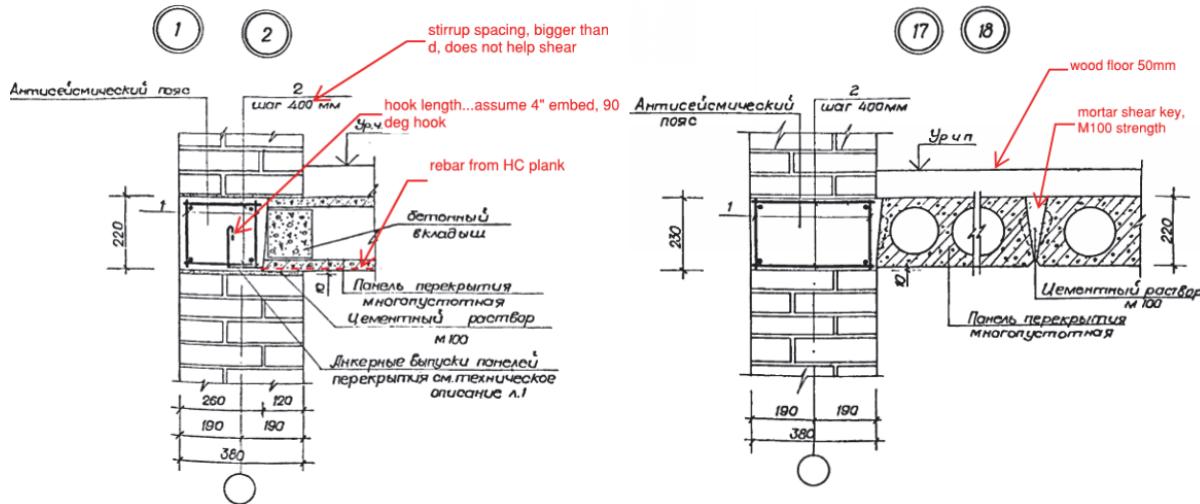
Plank to wall details. Note the positive anchorage in the load bearing direction and lack of anchorage in the non-load bearing direction.
